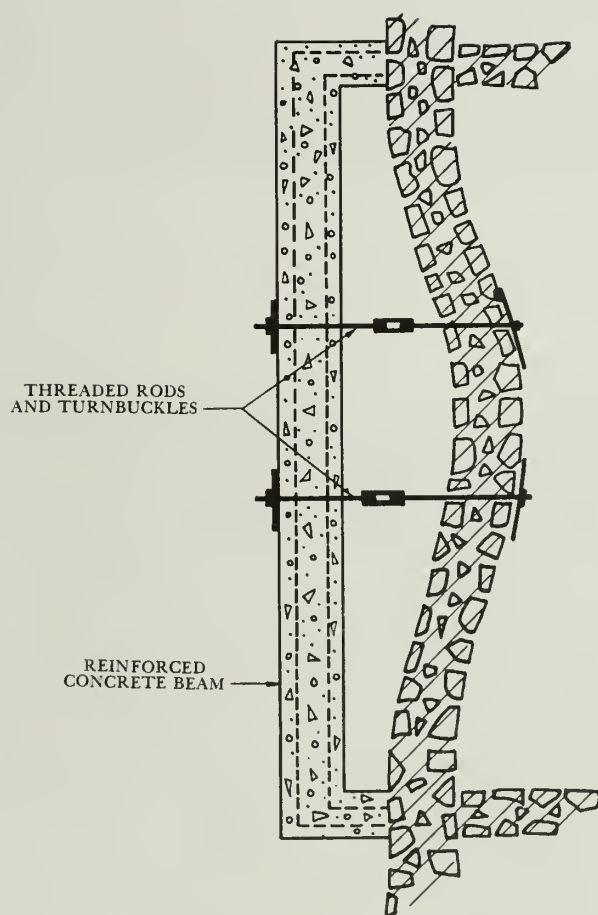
Plan of reinforced beam to realign and hold north wall, Room 27, Talus Unit No. 1 (not to scale).
